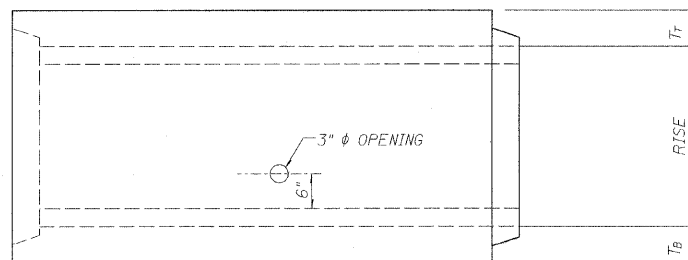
DETAIL OF PRECAST CONCRETE BOX CULVERT M273M
